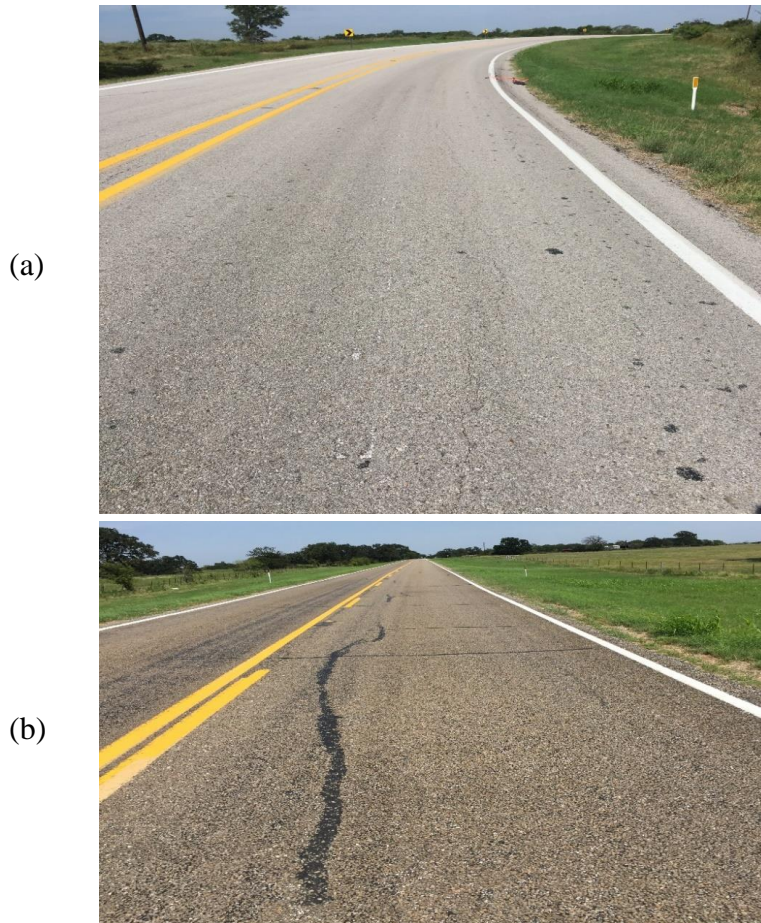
Example pictures from test sections at FM 1915: a) Section 1 (geosynthetic-stabilized section); b) Section 2 (control section)
